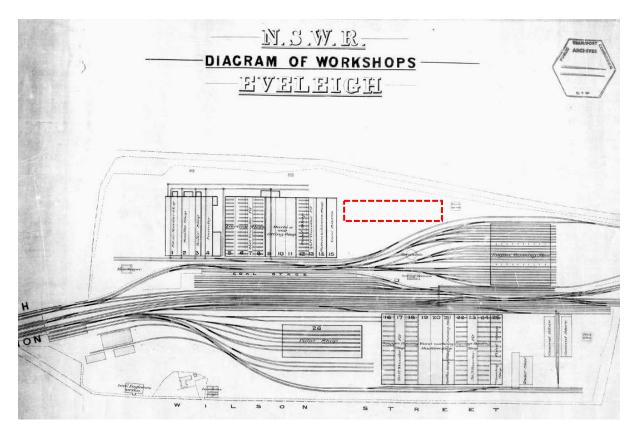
NSW Railways Diagram of Eveleigh Workshops, 1887, prior to the construction of the LES. Plan oriented to the south. The subject site location is marked in red. Source: NSW State Records (R560 1 11 7)
